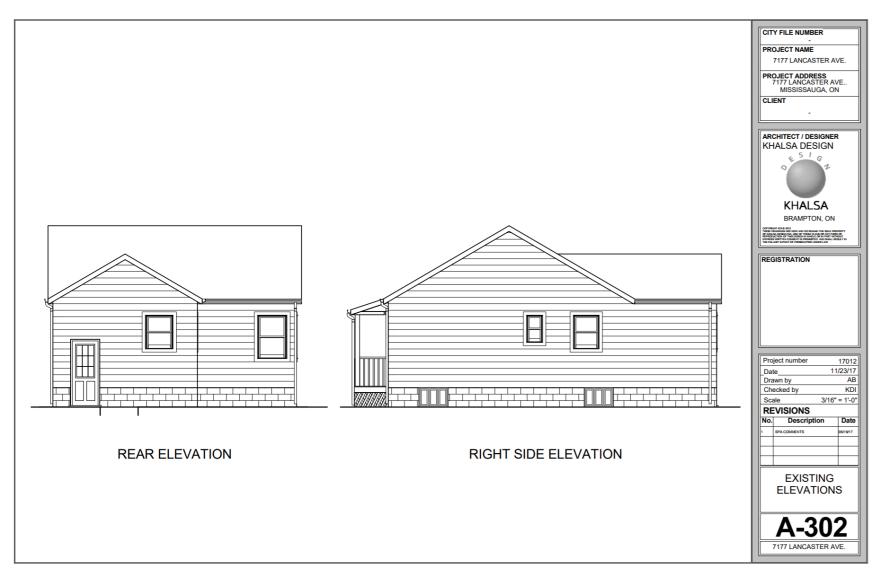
7177 Lancaster Avenue. Existing rear and right elevations. (Image: Khalsa Design, Nov 23, 2017)
